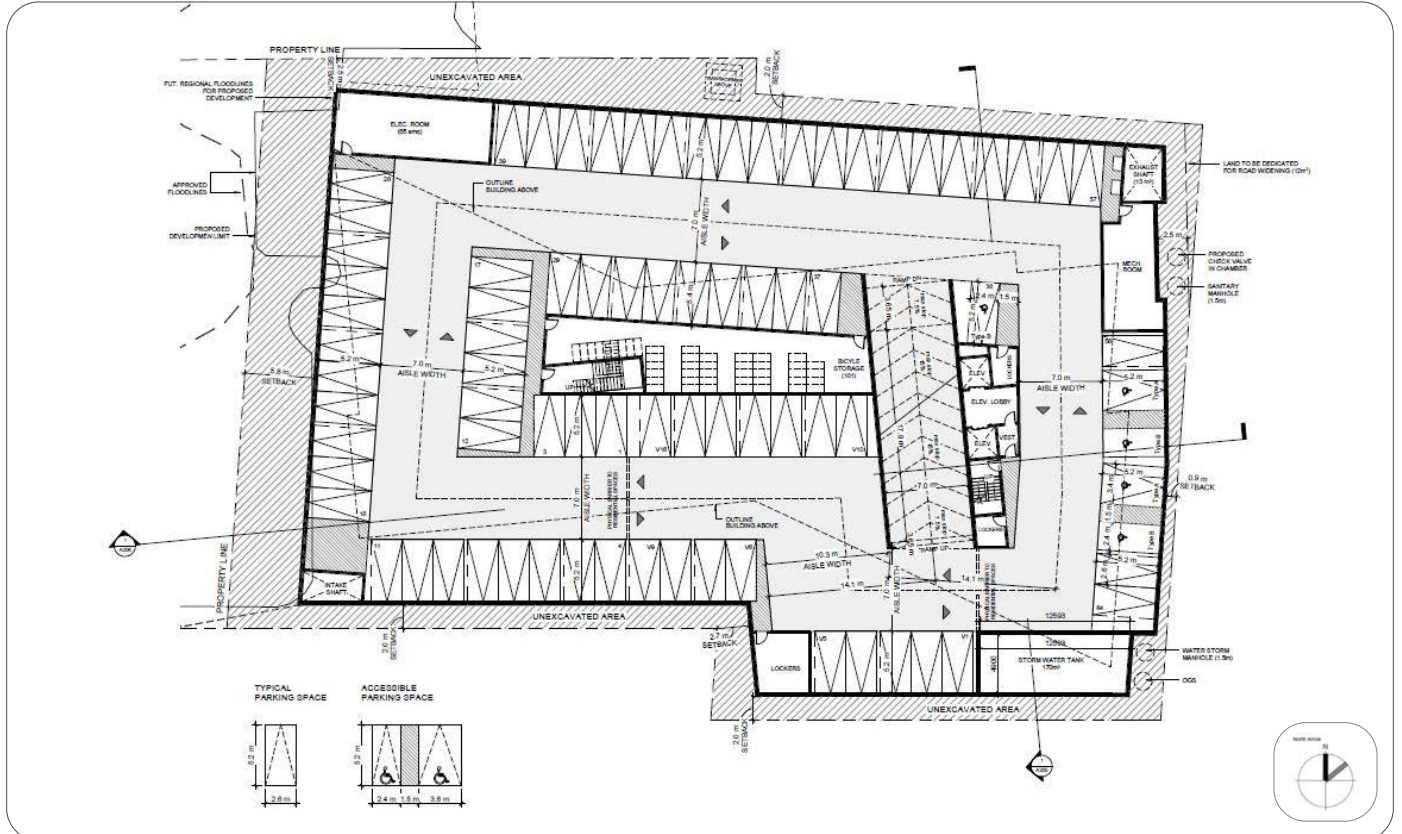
Underground Parking Garage Level 1, prepared by KFA Architects + Partners Inc.
